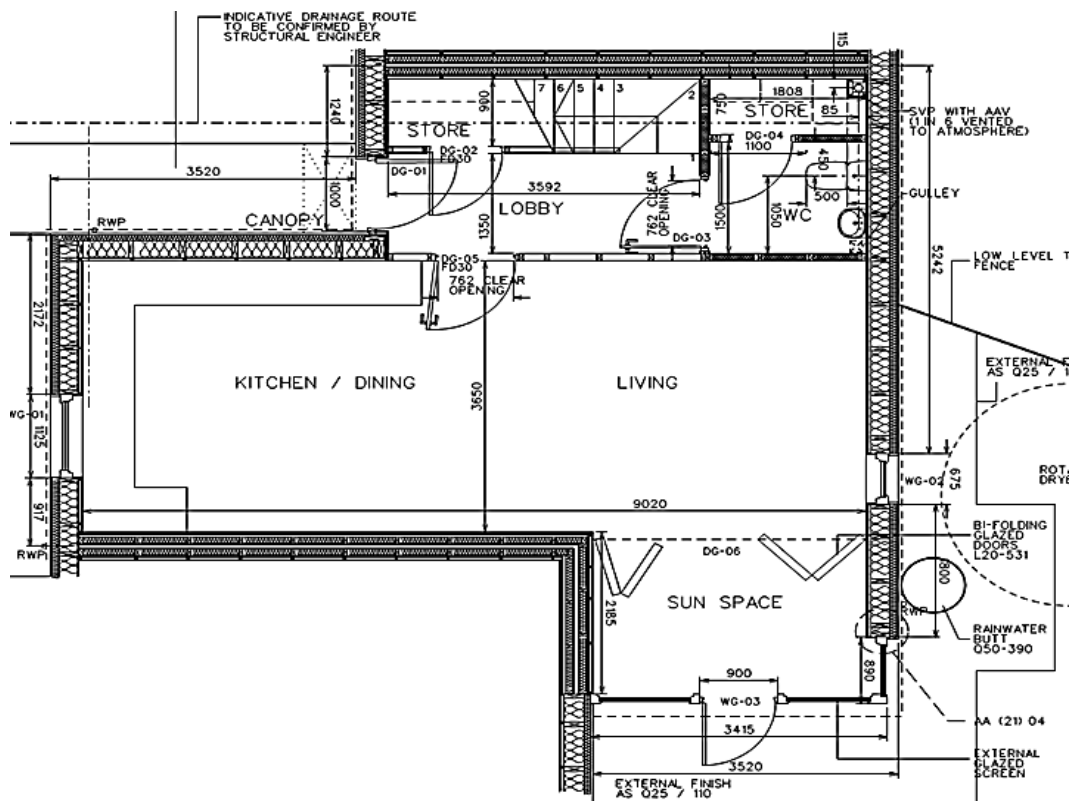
First Floor Plan Drawing of Representative House (Dwelling A)
